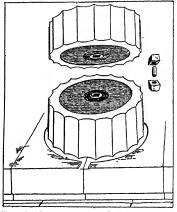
Construction of Columns, showing CENTRING PIN.
